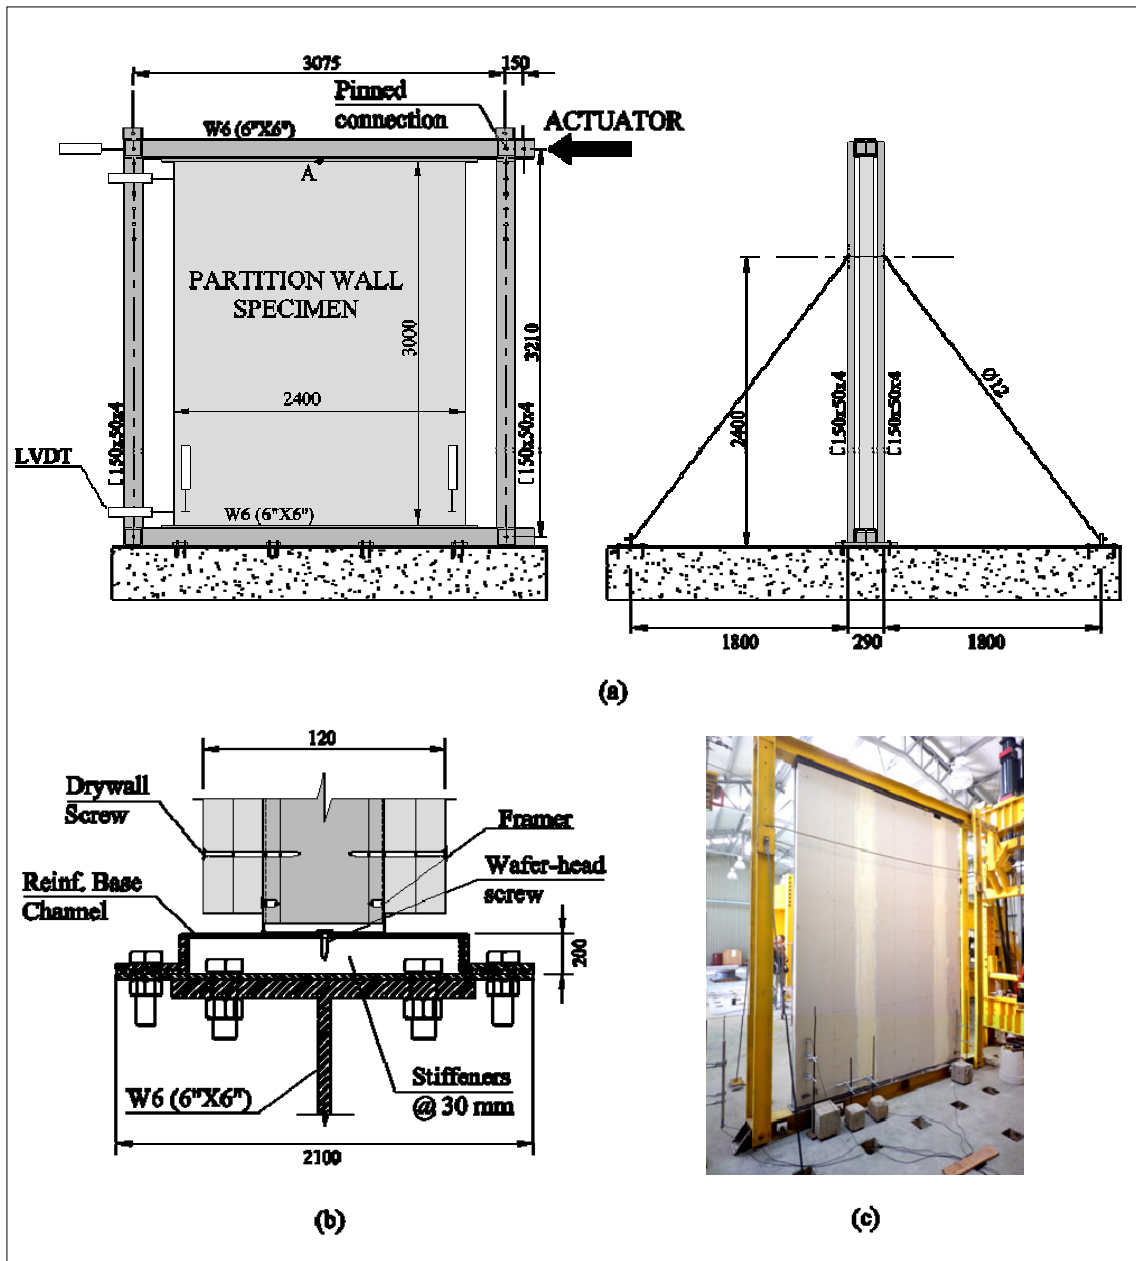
Set-up of tests of partition walls: (a) general elevation of testing frame and lateral elevation, (b) section of connection to bottom beam. (c) Installed specimen with instrumentation.
